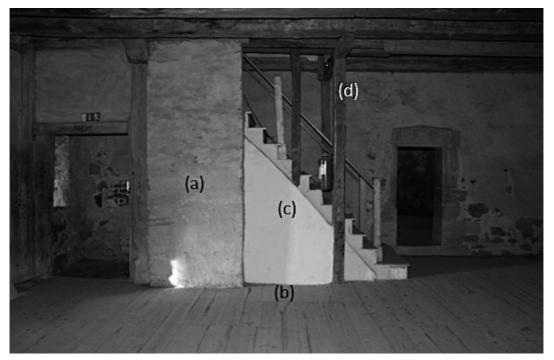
The staircase photographed from the eastern part of Room 1 (301). The chimney has continued up through the floor just north of the supporting pilaster (a) – a square in the wooden floor (b) can be seen where it once went up. Notice the new plaster and stairs (c) leading up to Room 2 (401), and the remains of the supporting wooden structure (d) at the base of the stairs. Photo by S. Lind 2012.
